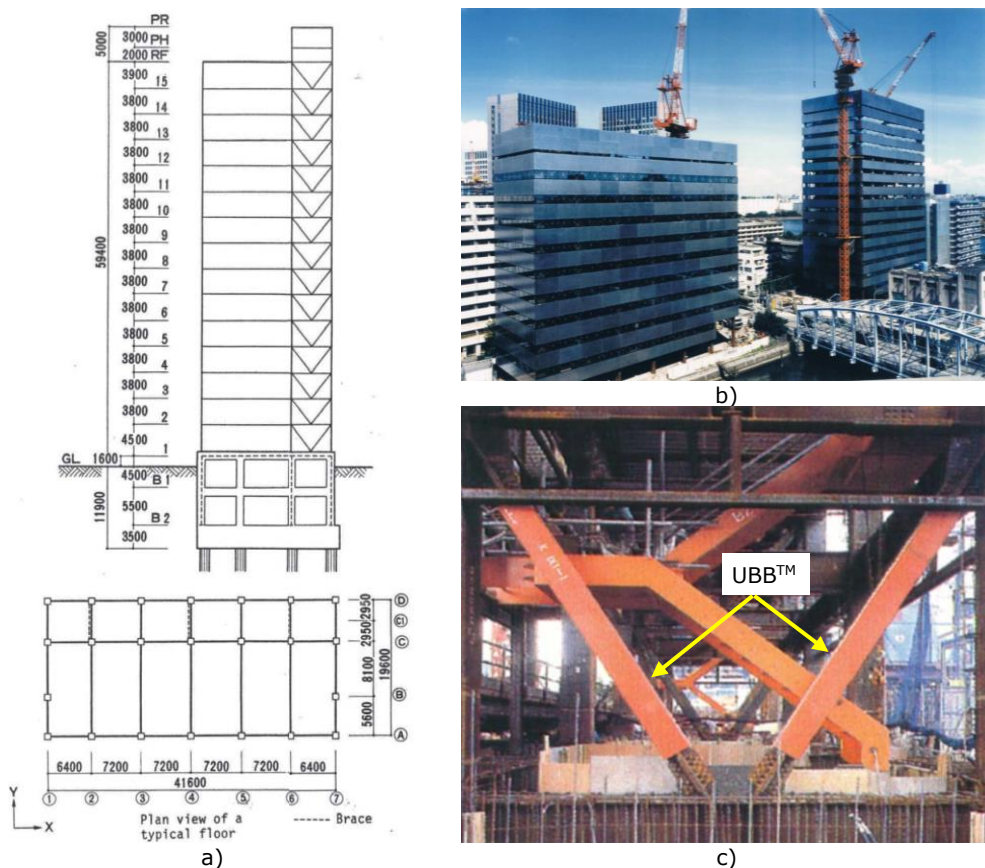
First BRB (UBB™) application: Nippon Steel Headquarter No. 2, Tokyo, Japan, 1989: a) elevation and plan views [51], b) perspective view, c) BRB layout [1]
